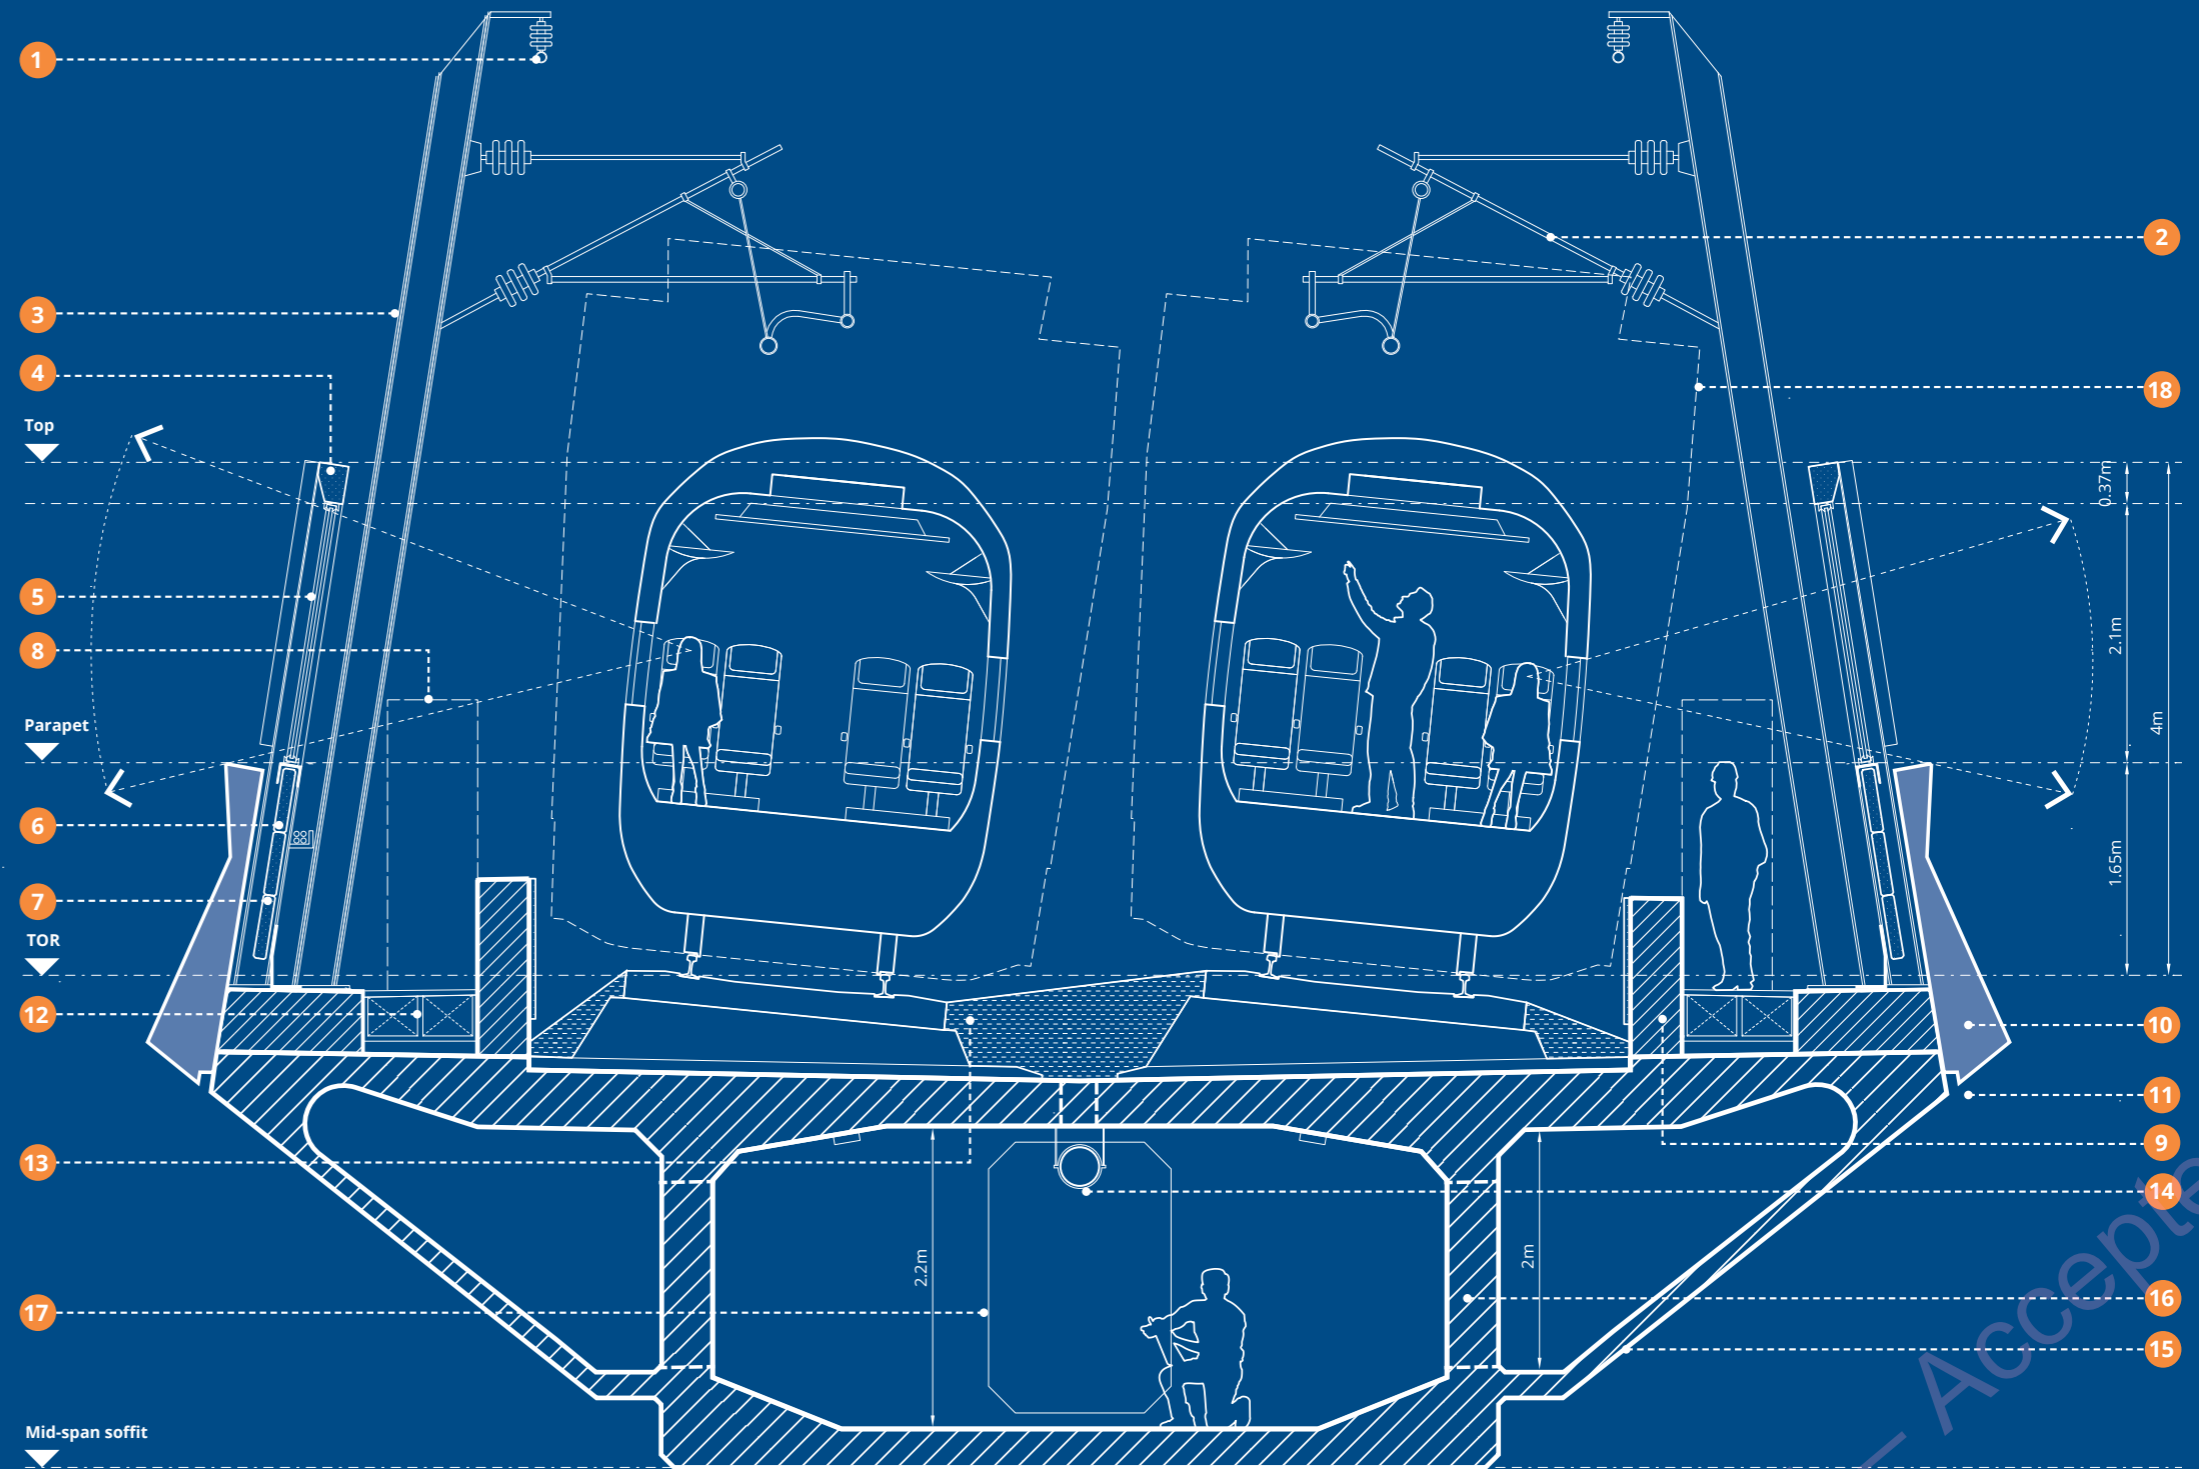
\_ Proposed cross section - Typical viaduct deck at mid-span
